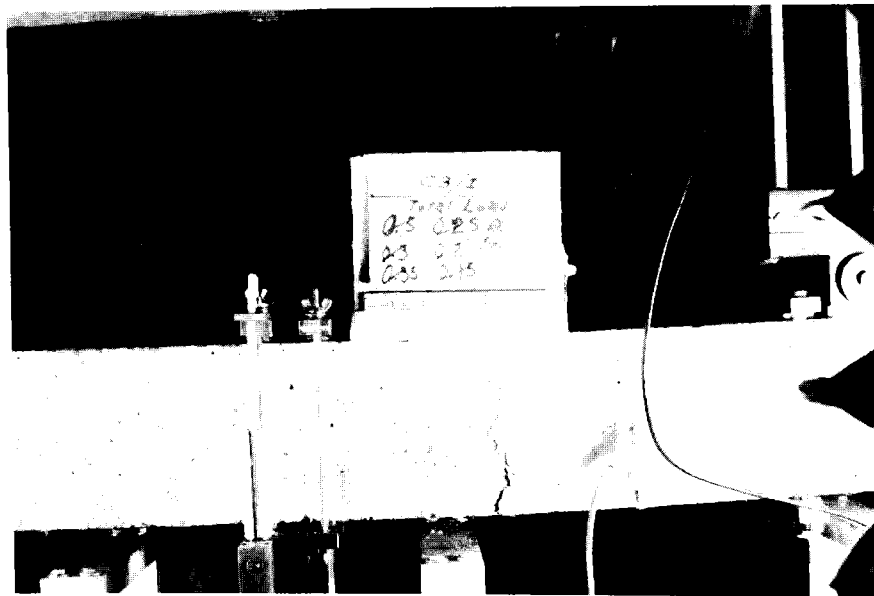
TEST ARRANGEMENT FOR BEAMS
